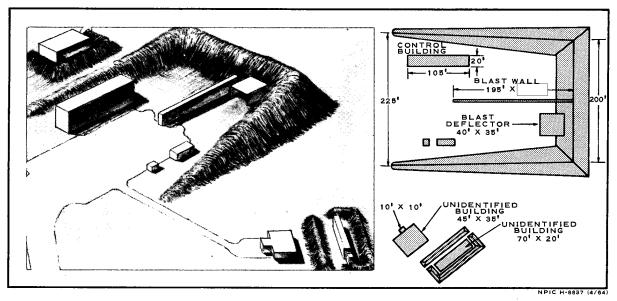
PLAN AND PERSPECTIVE VIEWS OF AIRCRAFT TEST REVETMENT, SHEN-YANG AIRFRAME PLANT 112.
